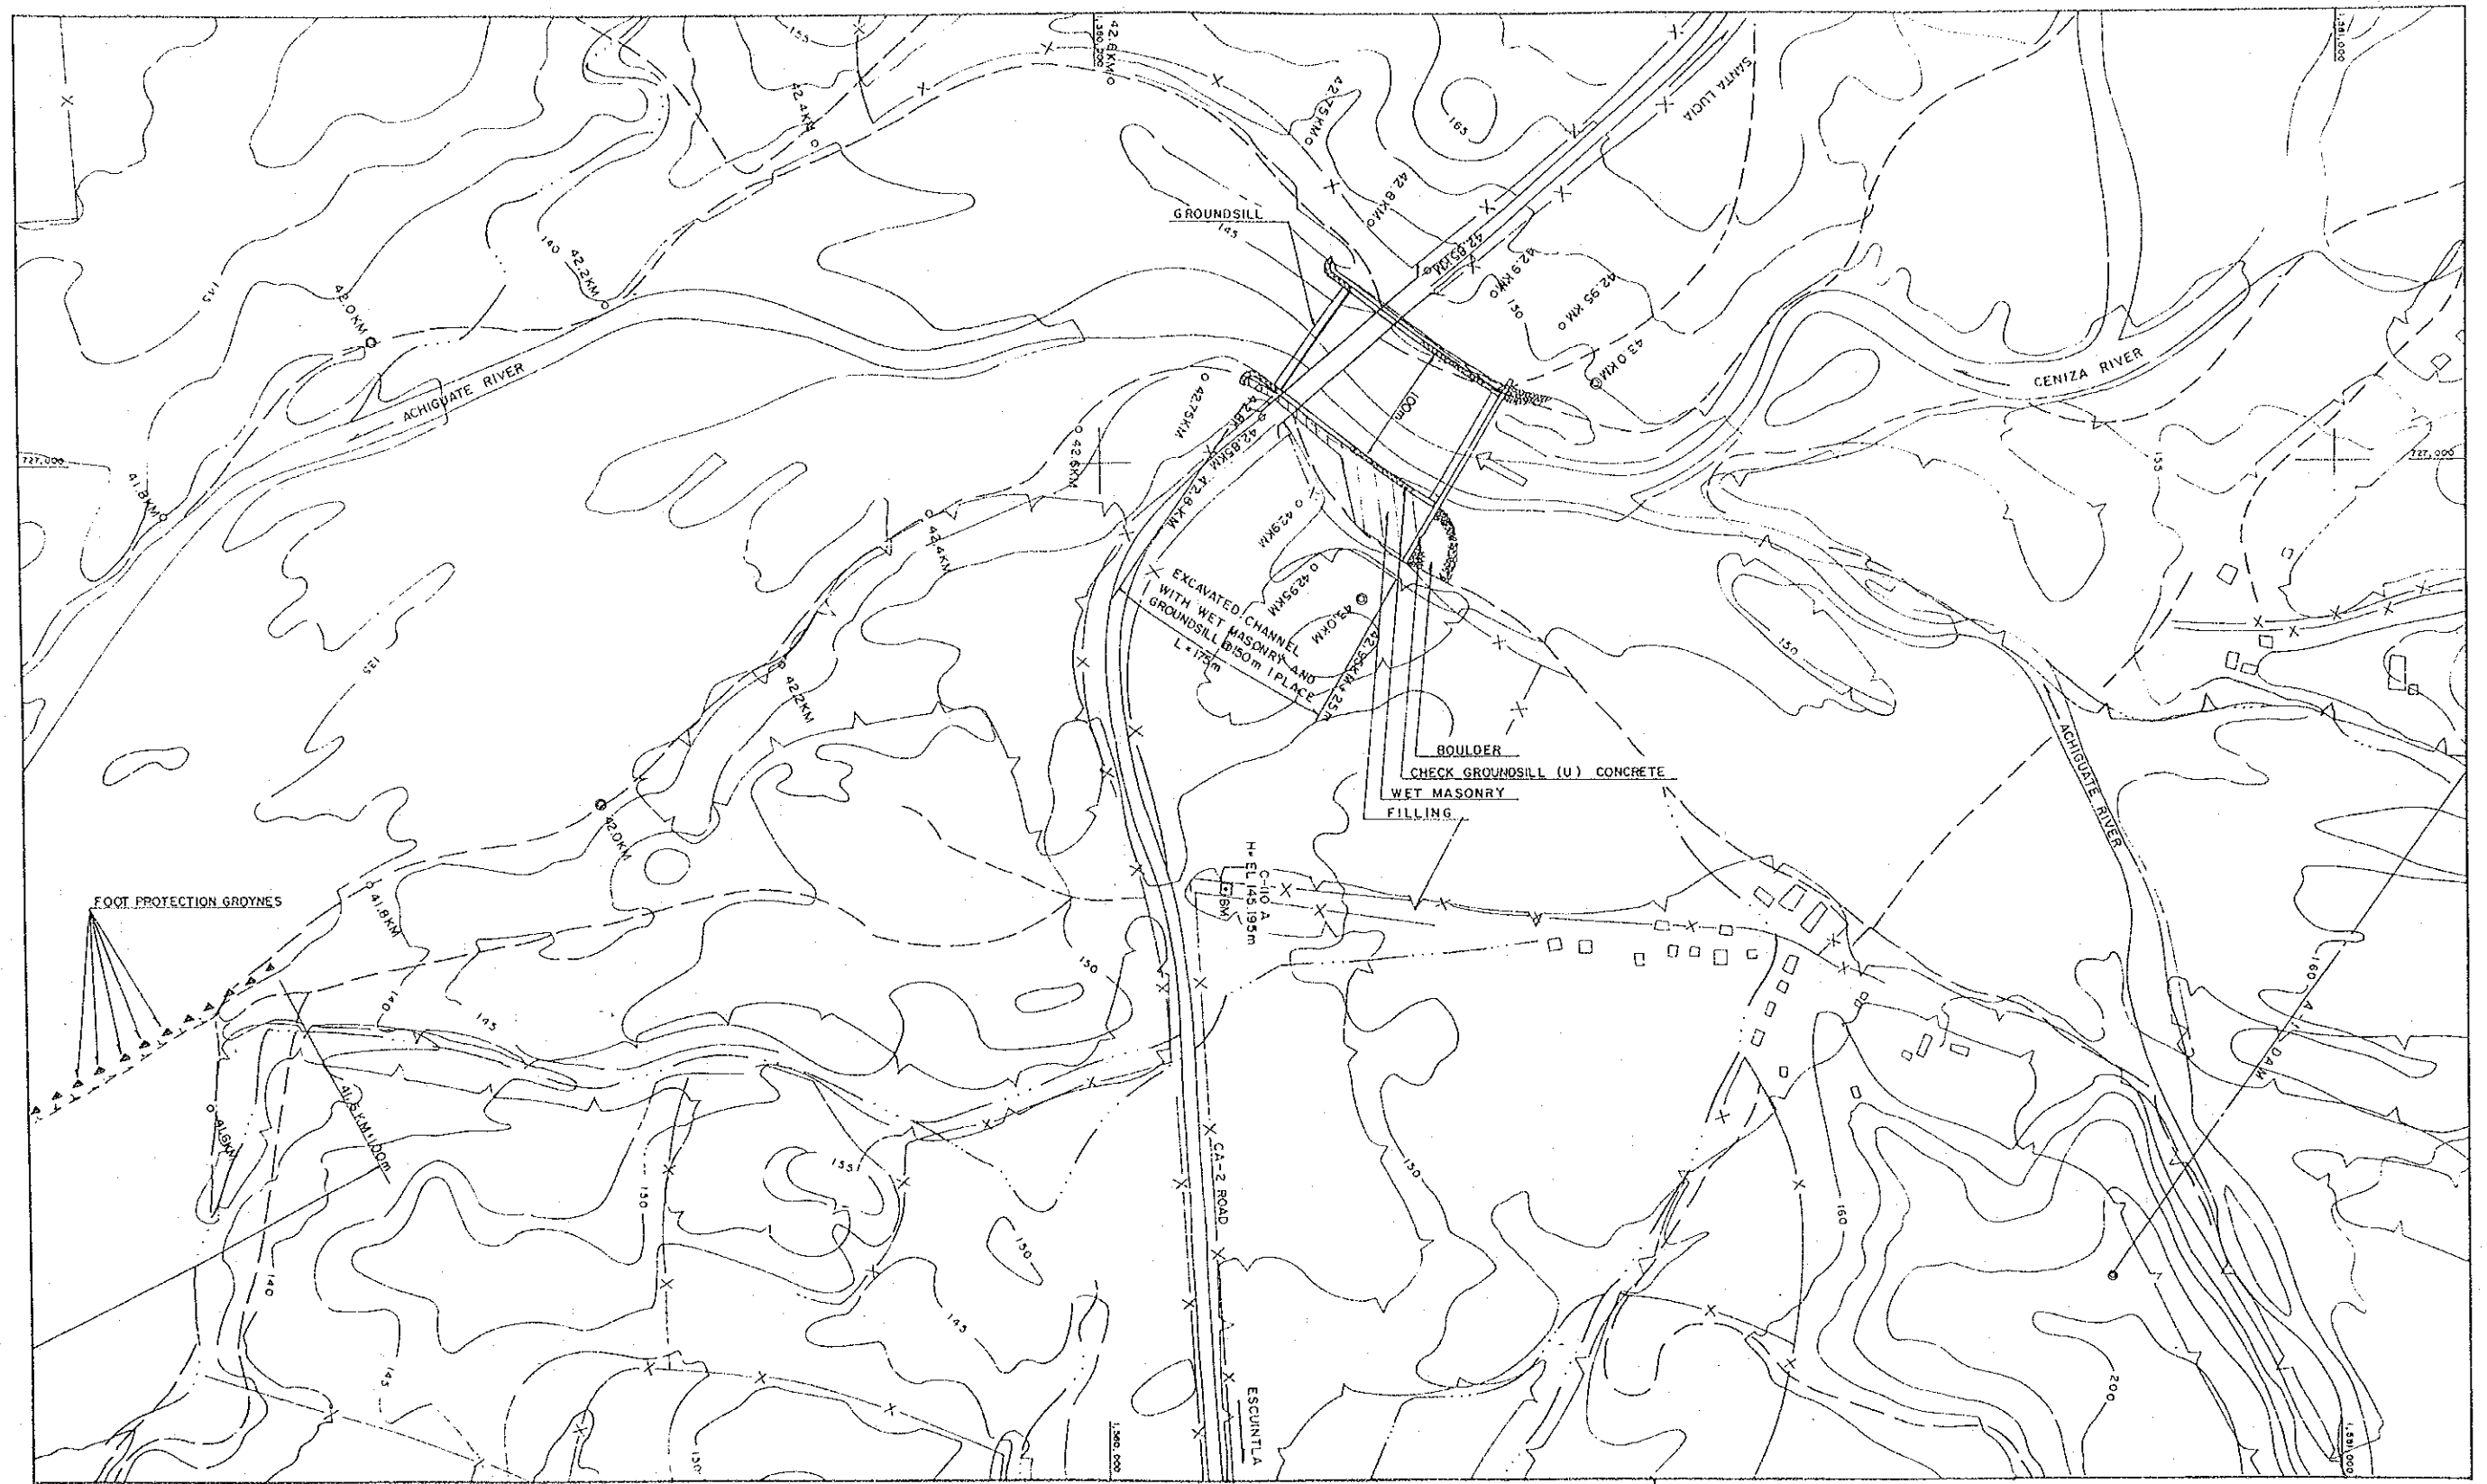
(2/6) PLAN OF RIVER IMPROVEMENT
